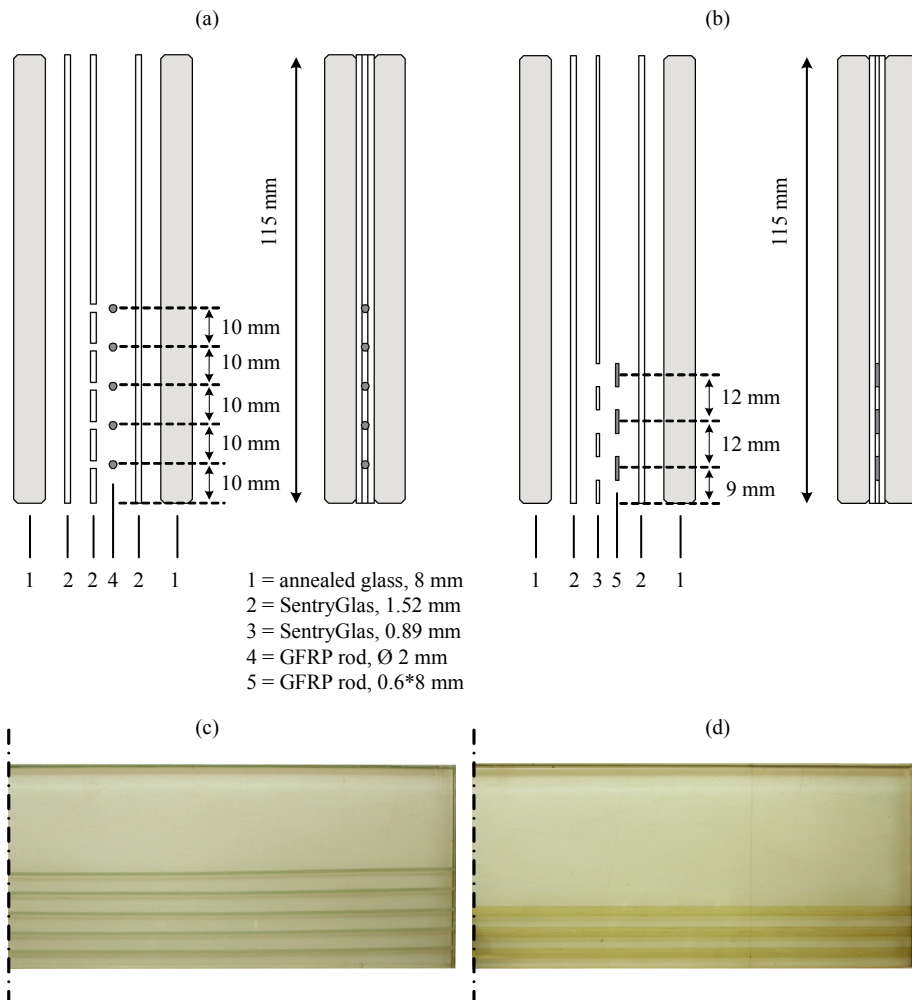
Beam specimens with round or flat GFRP rods embedded in the SG interlayer; (a) & (b) exploded and assembled cross-section; (c) & (d) Close-up photograph of the laminated specimens (side view).
